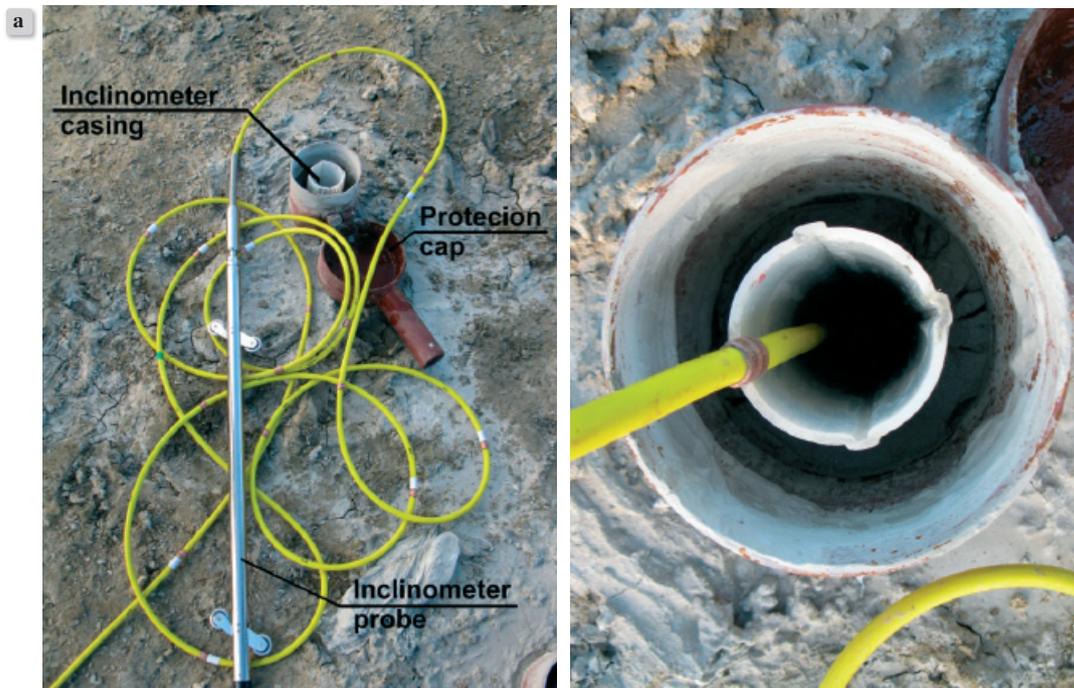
Set for inclinometer measurements: a) guide casing, cap, probe; b) guide casing details
